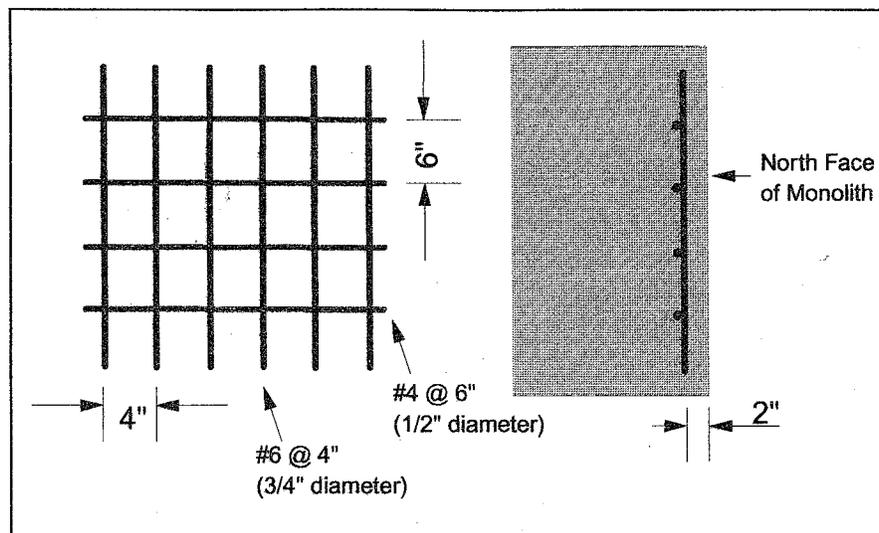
Dimensions and configuration of reinforcing steel beneath the surface of the concrete
